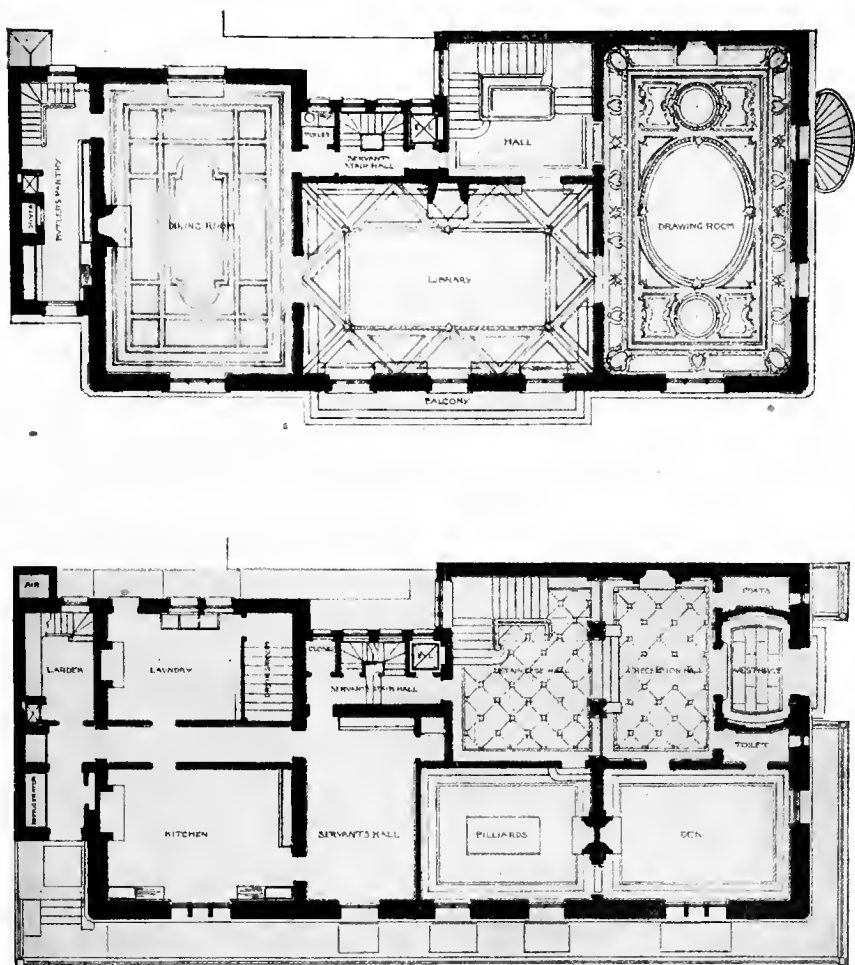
PLANS OF RESIDENCE OF R. FULTON CUTTING, ESQ., 67TH STREET AND MADISON AVENUE, NEW YORK CITY.
